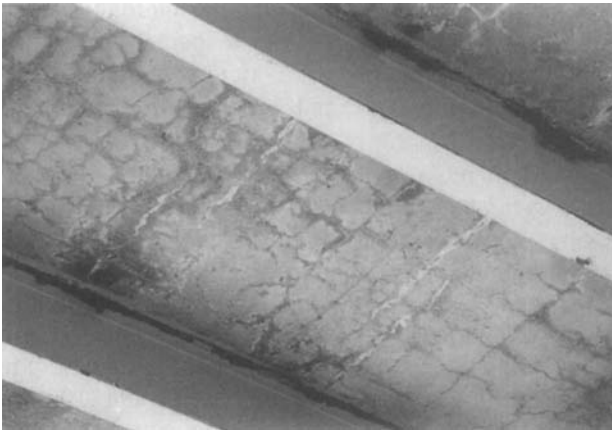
Inspections must be thorough to note deterioration such as "alligatoring" that appeared on the underside of the reinforced concrete deck at New York's Tappan Zee Bridge.
